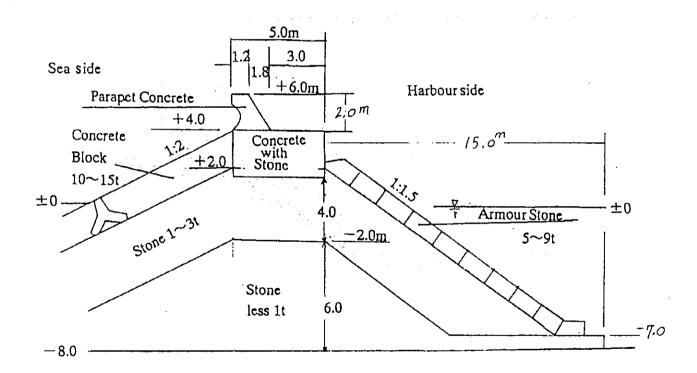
Typical Cross-section of Proposed Breakwater
